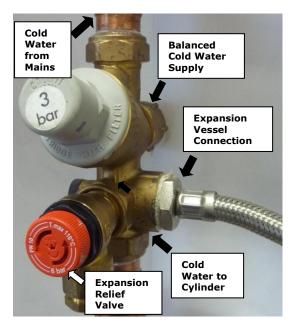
Detail Showing The Connection Of The Expansion Vessel To The Inlet Group
